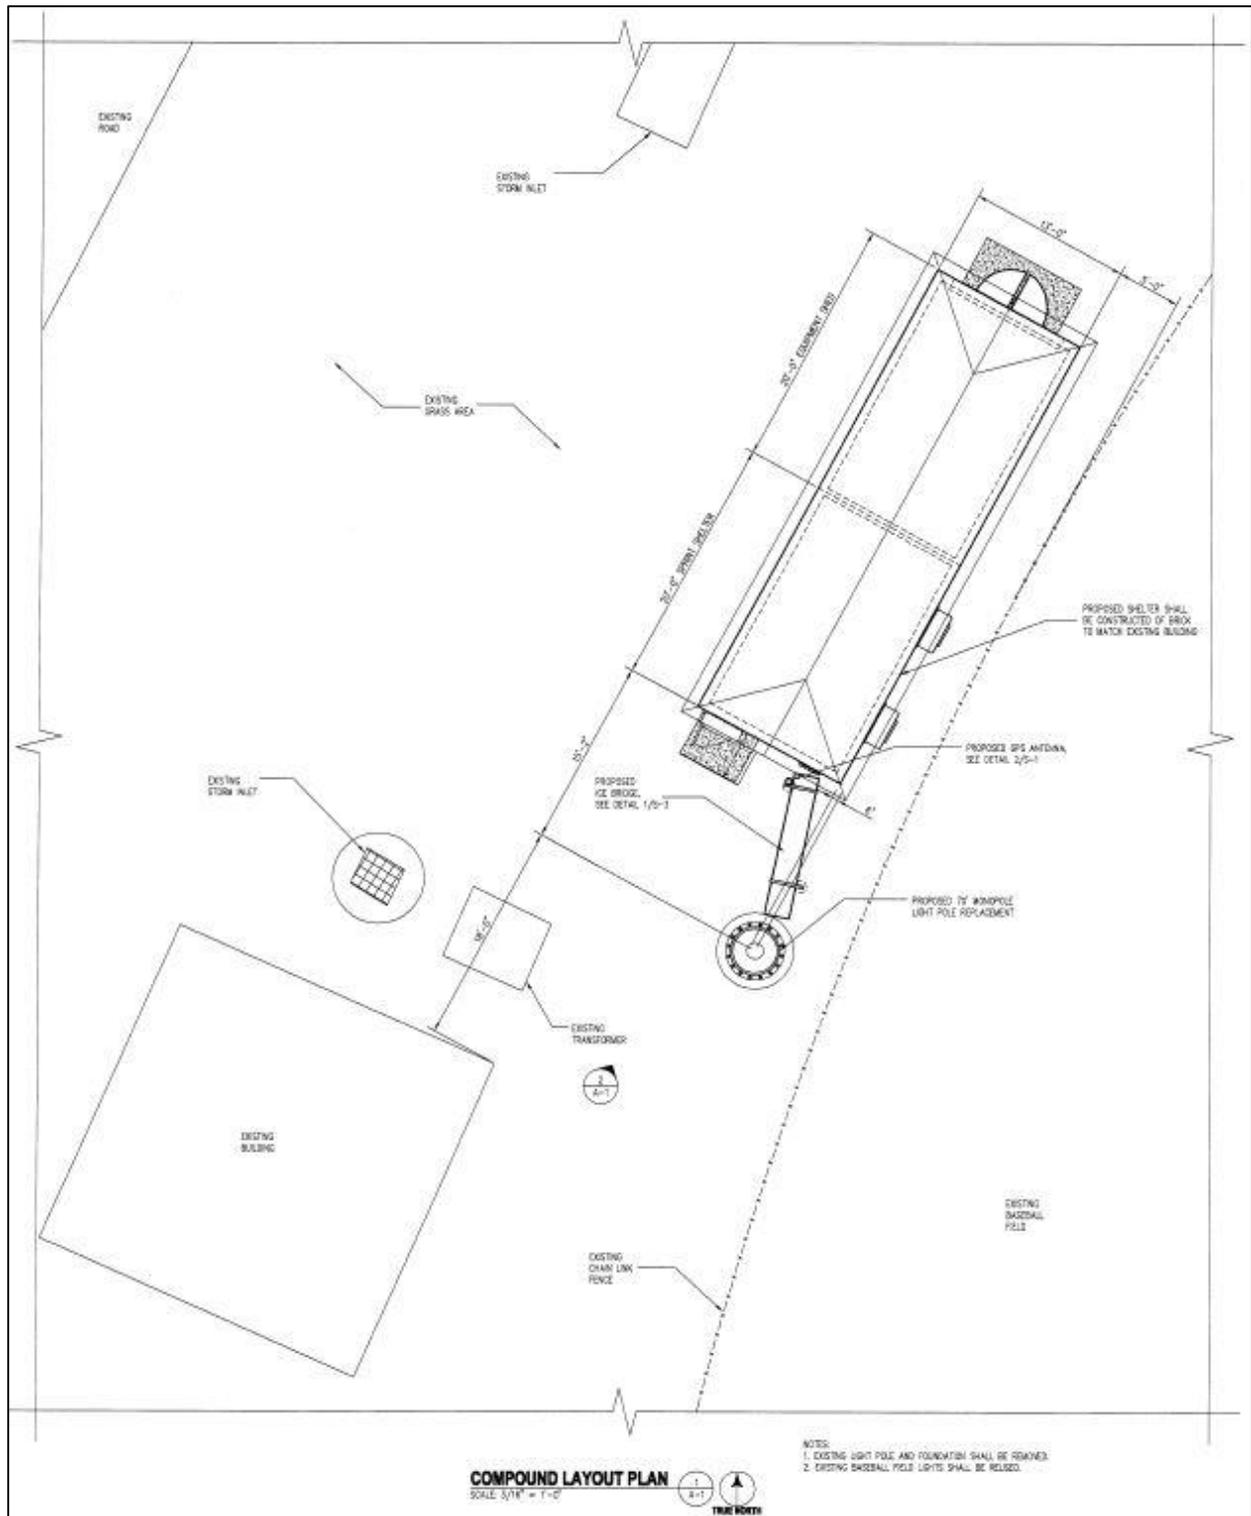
Proposed Monopole and Equipment and Storage Building Plan
